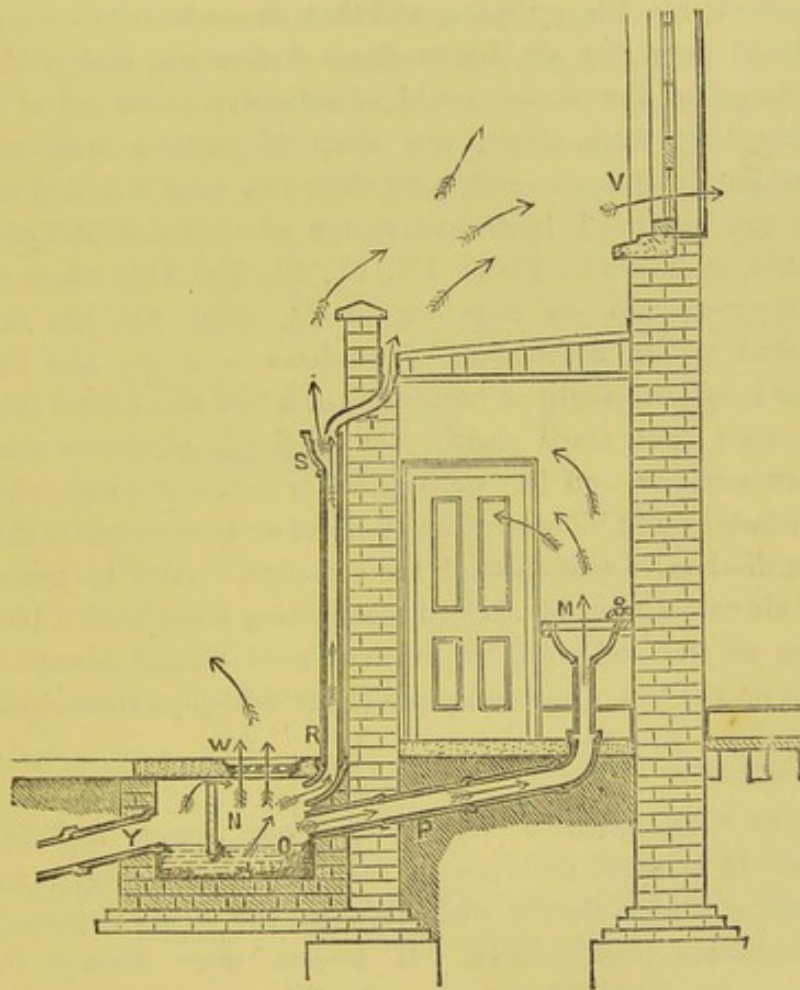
Waste-pipes without a trap—bad arrangement.
